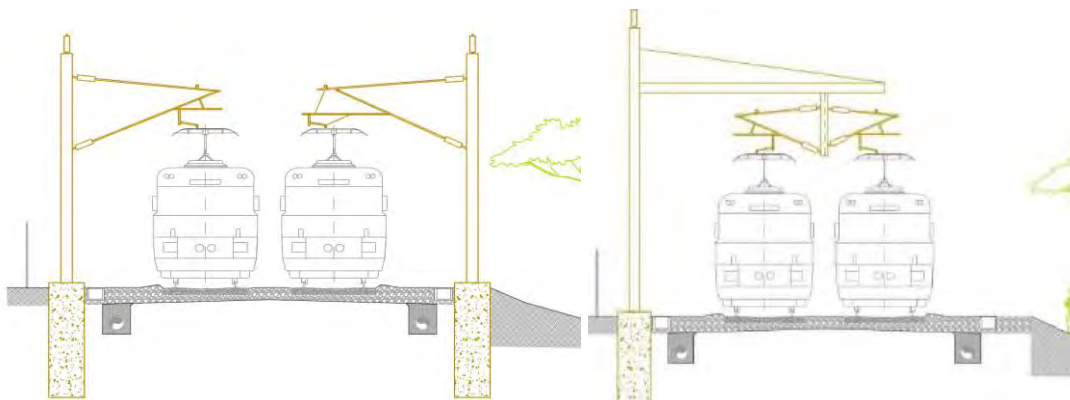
Single track cantilever cross section (left) and twin track cantilever cross section (right)
